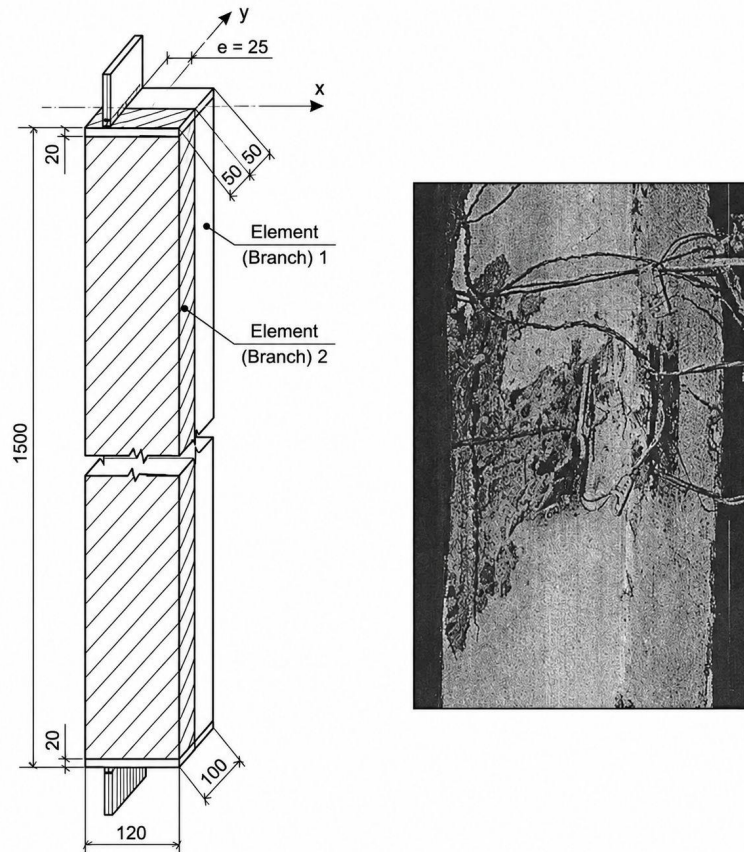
Testing scheme for Series K-II columns under eccentric compression and photograph of column failure
